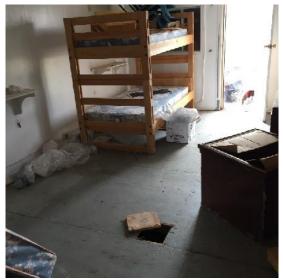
View of the bedroom (Room 2) inside the accommodations cabin at Camp #1.
